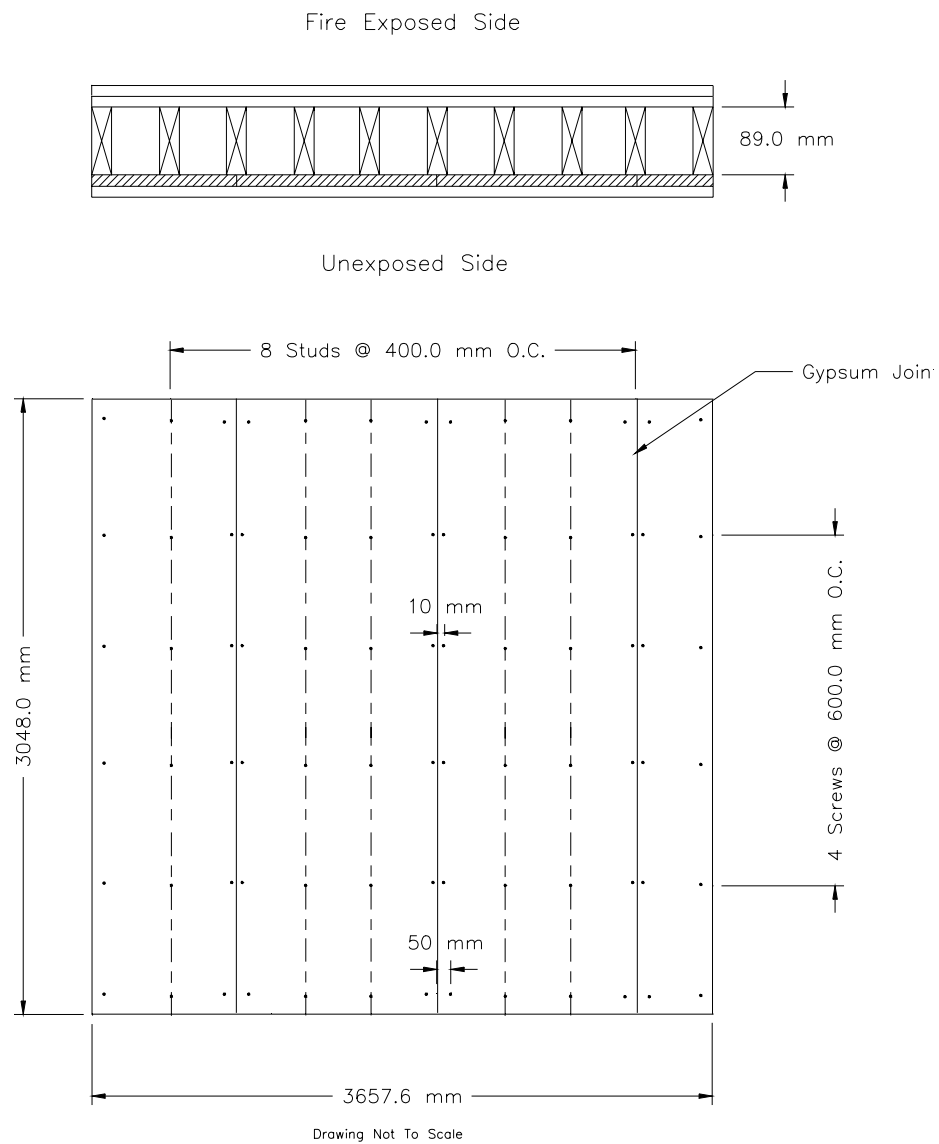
Screw Locations For Wood Stud, 2x2 Gypsum Board Layers, Full-Scale Assembly (Base Layer, Unexposed Side)
